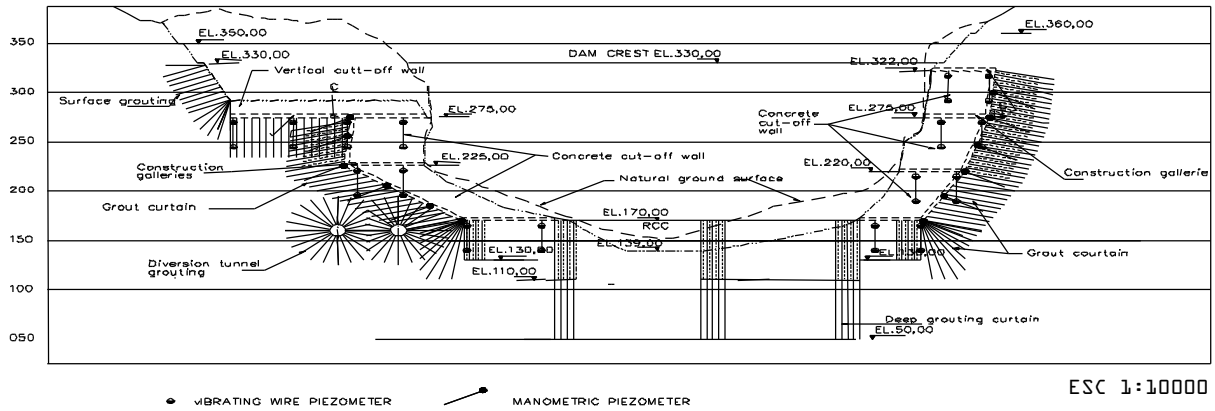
Sogamoso dam: Foundation treatment: galleries and grout curtain
